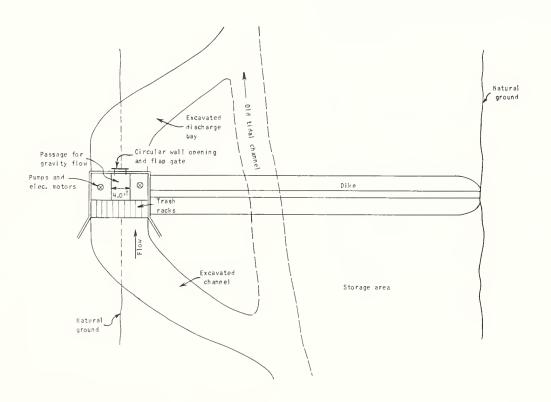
Plan View Showing Typical Installation of Dike - R/C Pump Structure - Tide Gate and Channels
